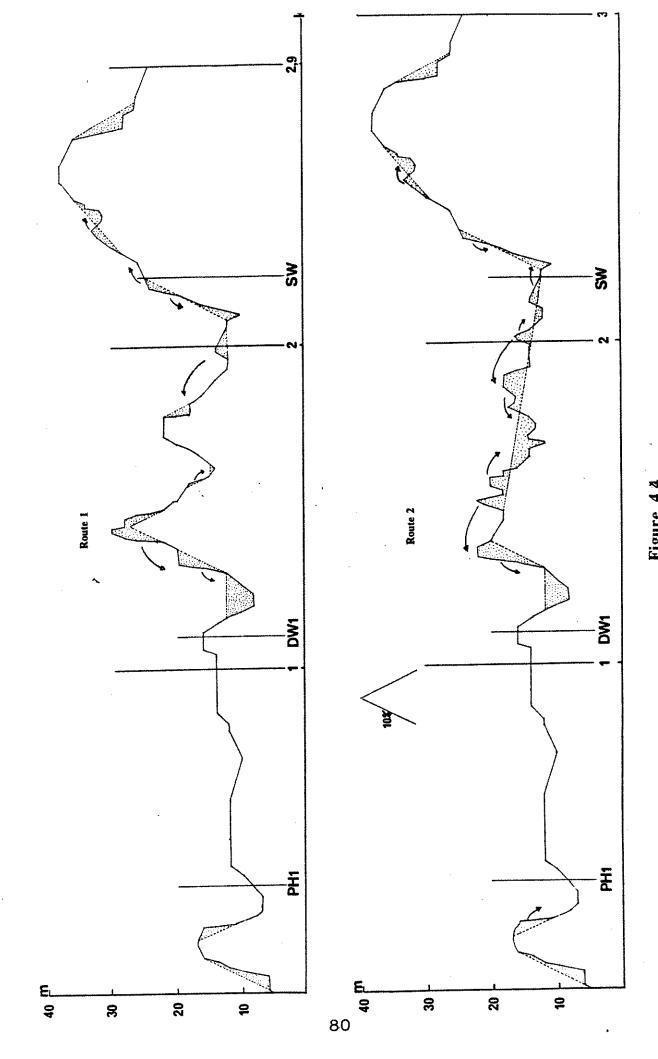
Cut and Fill of Potential Routes for the Access Road
